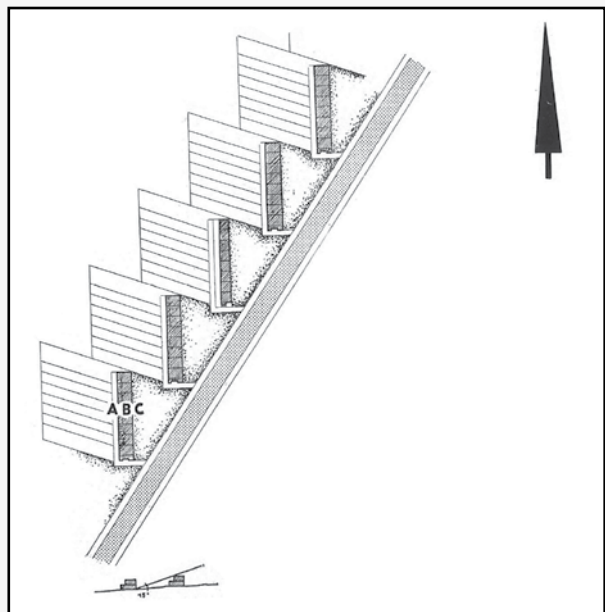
The site plan that appeared in *Rationelle Bauungsweisen* showed five building blocks when only one was realised. Giedion 1931c, sheet 13.
